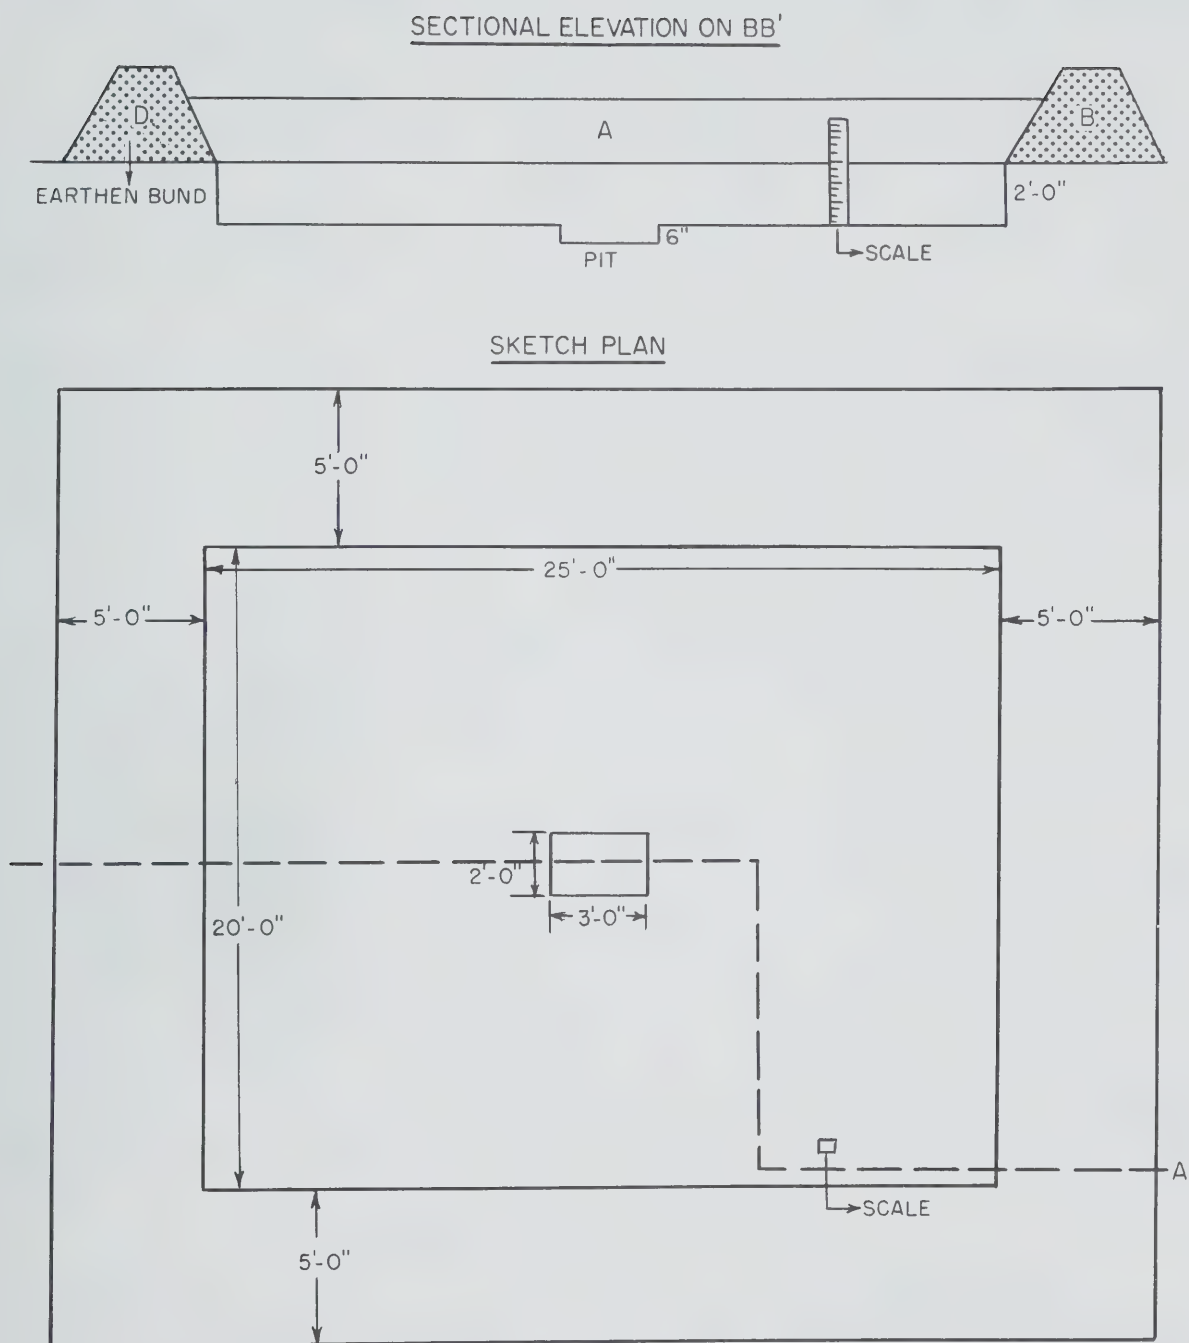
Plan of reservoir for collecting and measuring run-off water.
